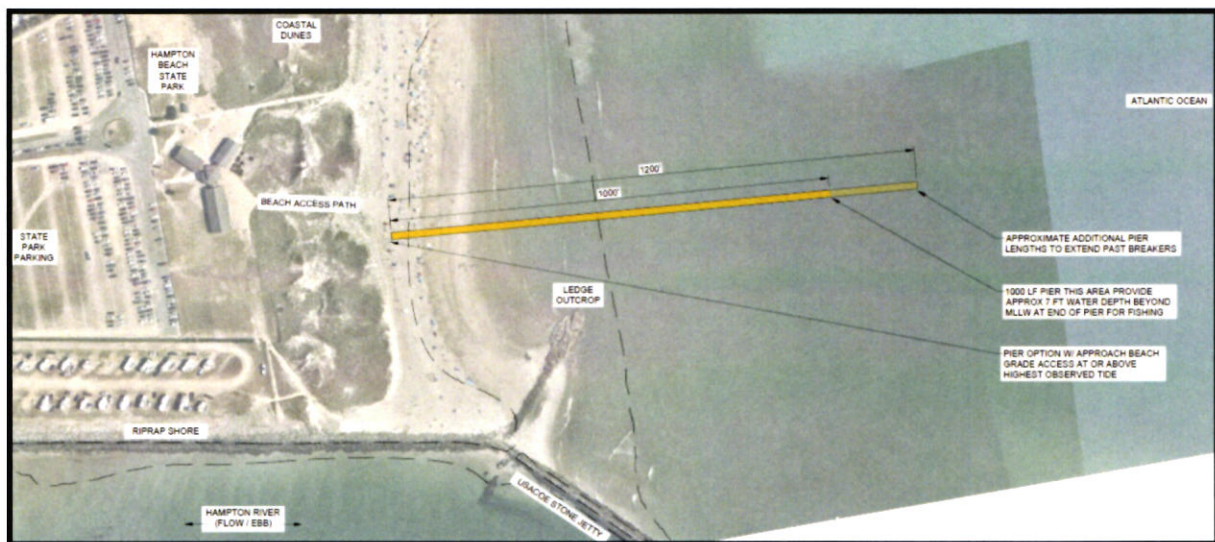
Portion of Area 3 (State Park) Proposed Pier Location Options Concept Plan
